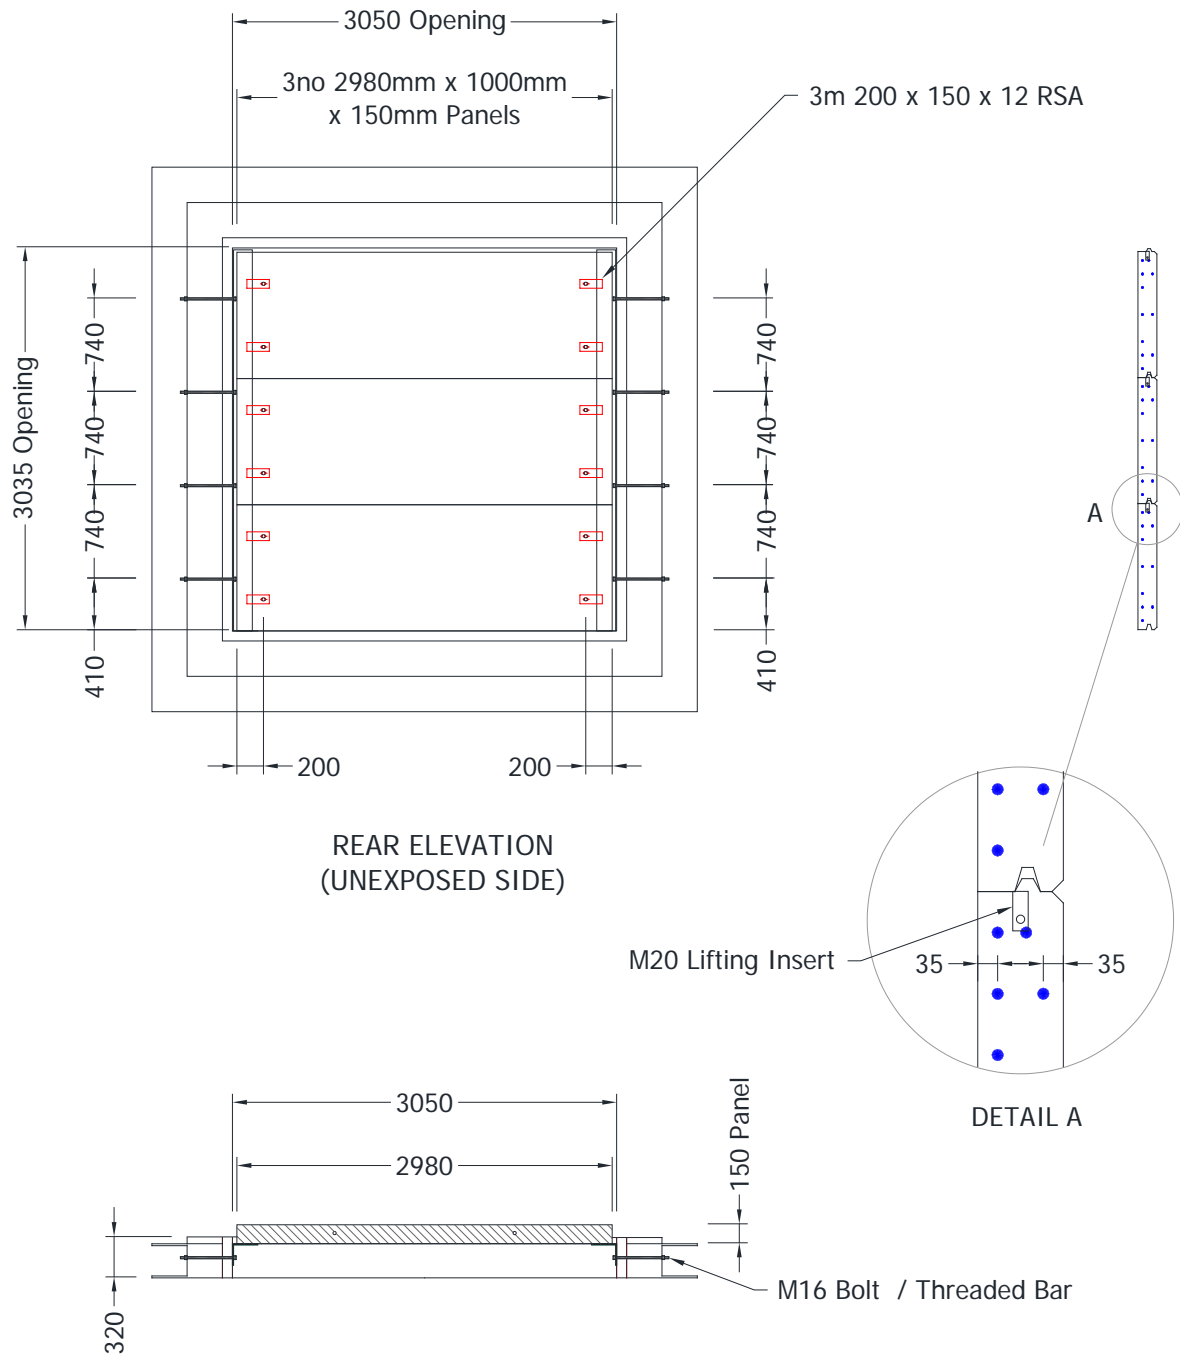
General Elevation of the Unexposed Face of the Test Construction
